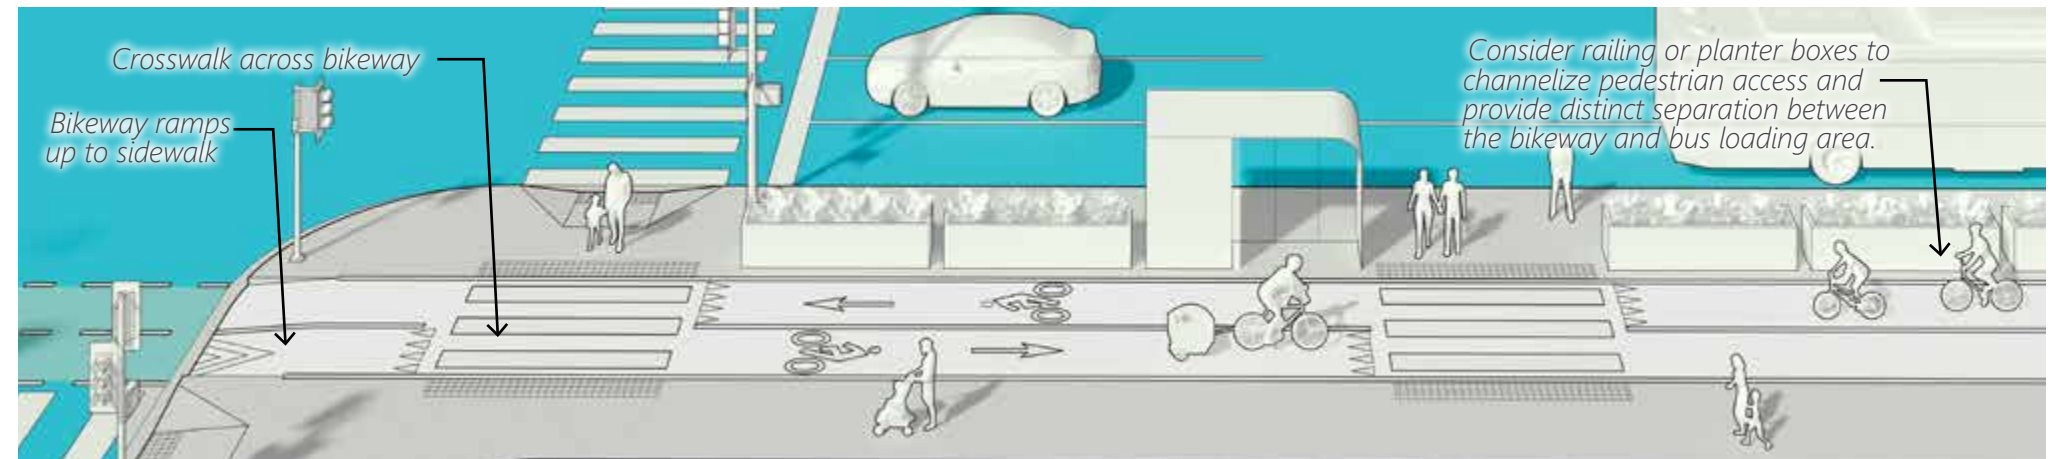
Two-Way, Sidewalk-Level, Class IV Bikeway at a Far-Side, In-Lane Loading Bus Stop.
